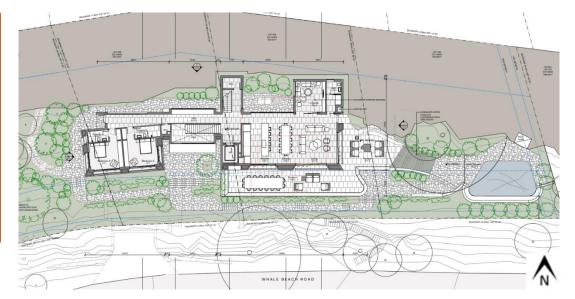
Proposed Level 1 floor plan, Extract from Level 1 Plan (Source: Drawing No. 1103, Rev. A)
